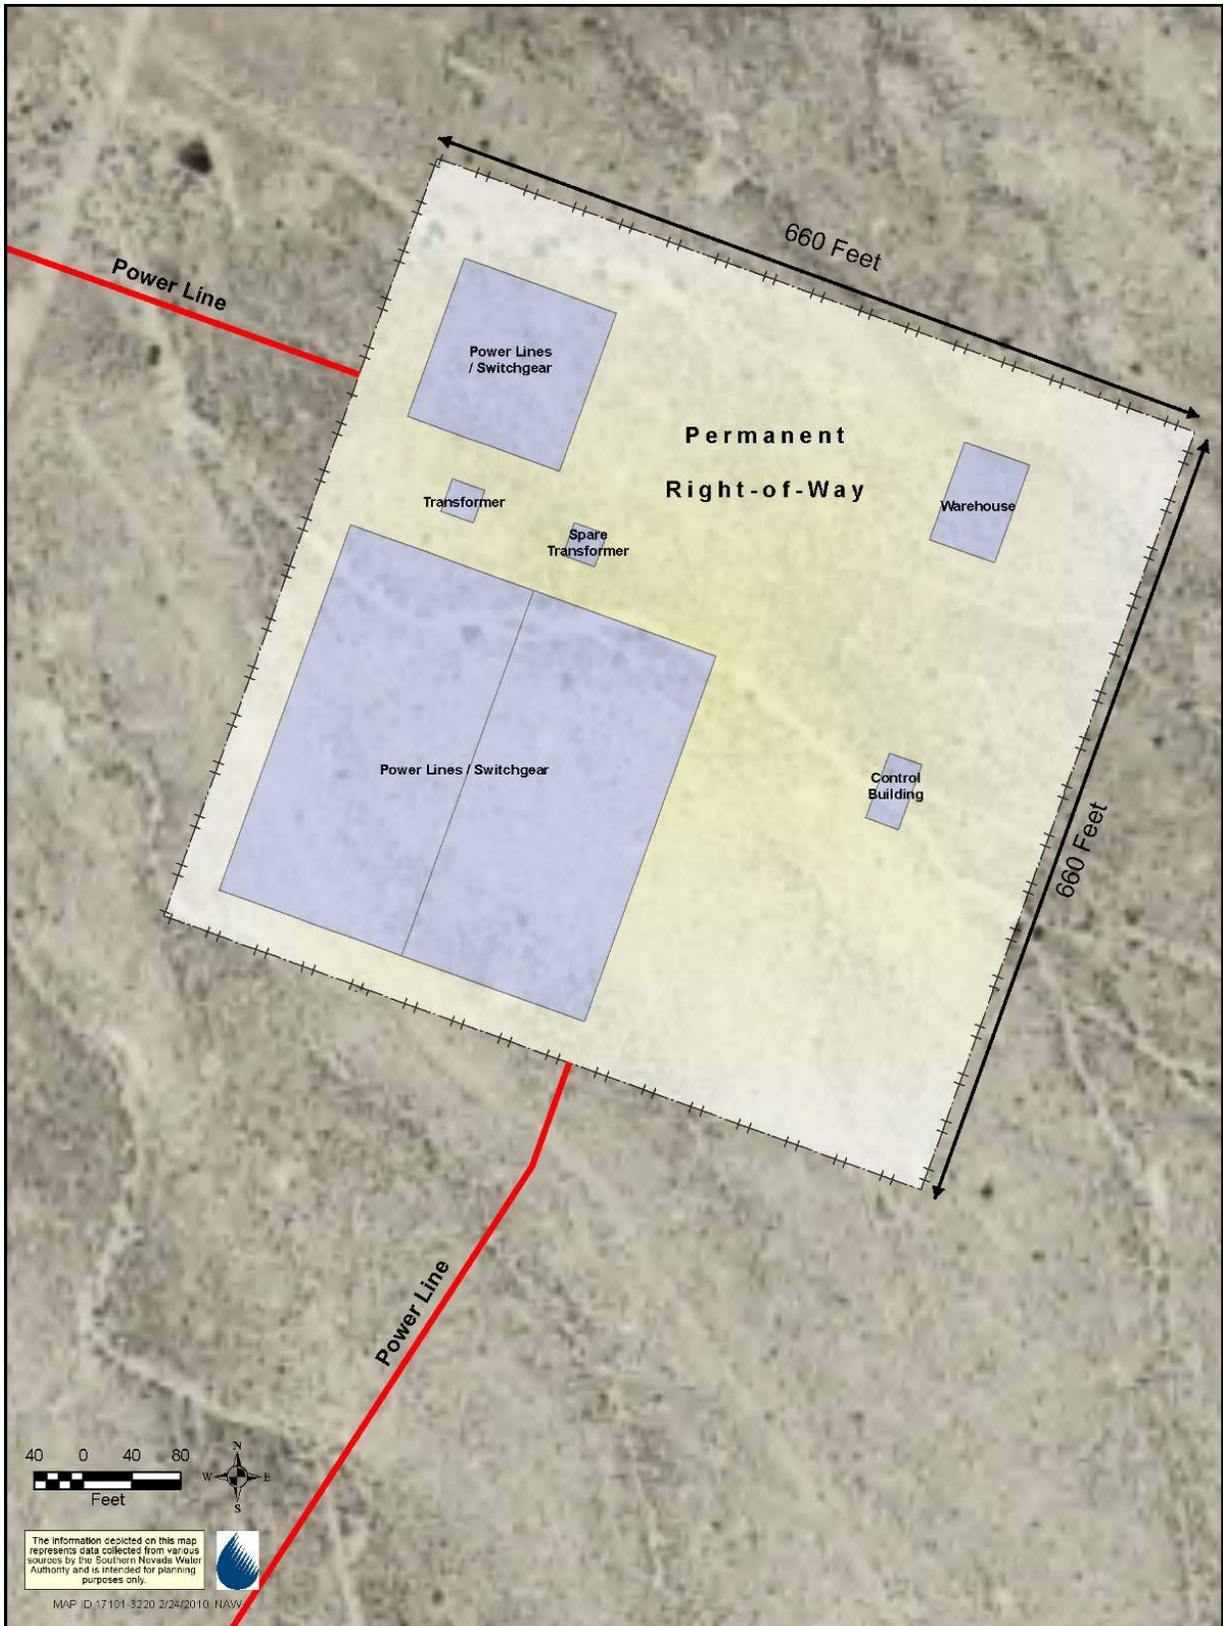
Preliminary Primary Electrical Substation Site Plan
